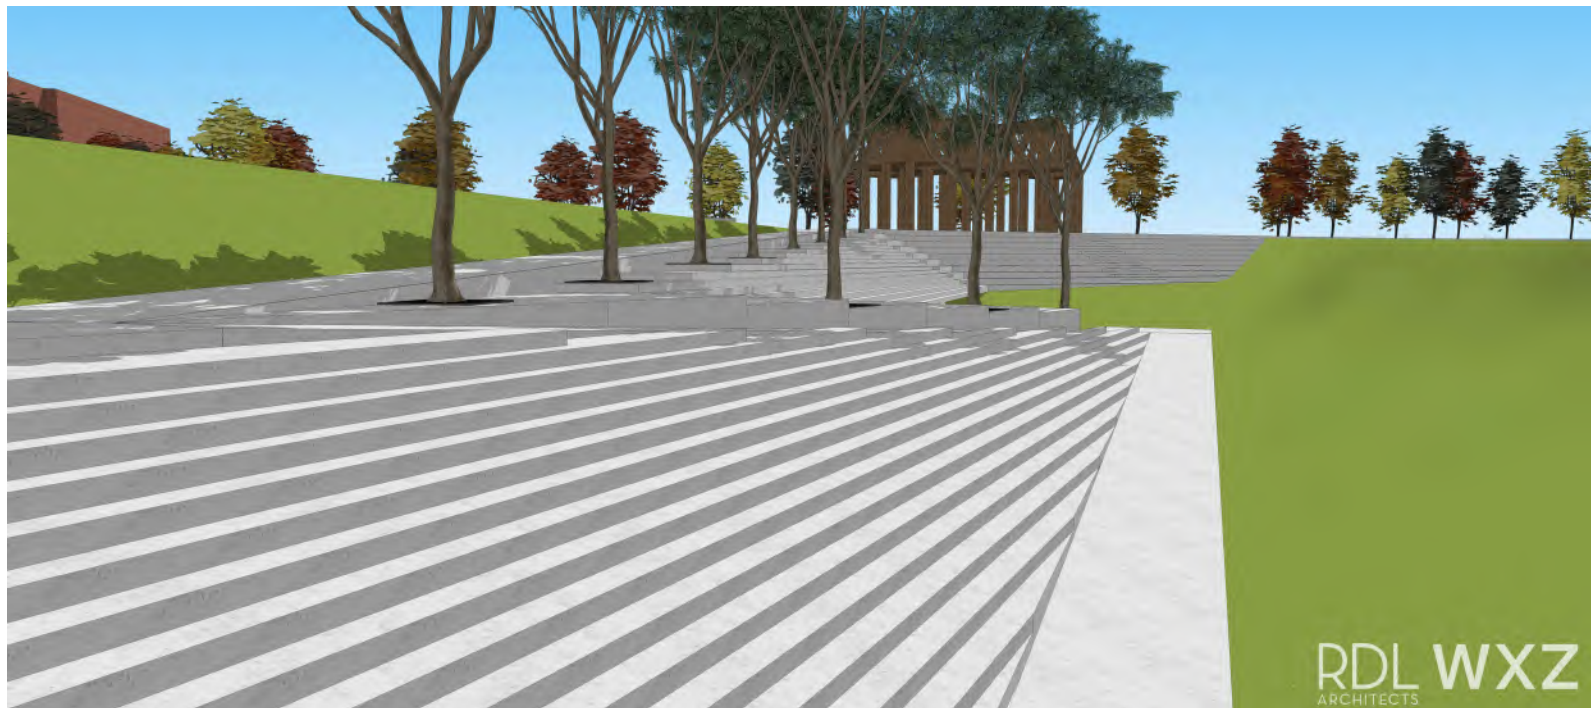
Exhibit D: Cain Park Village Stramp Conceptual Rendering
